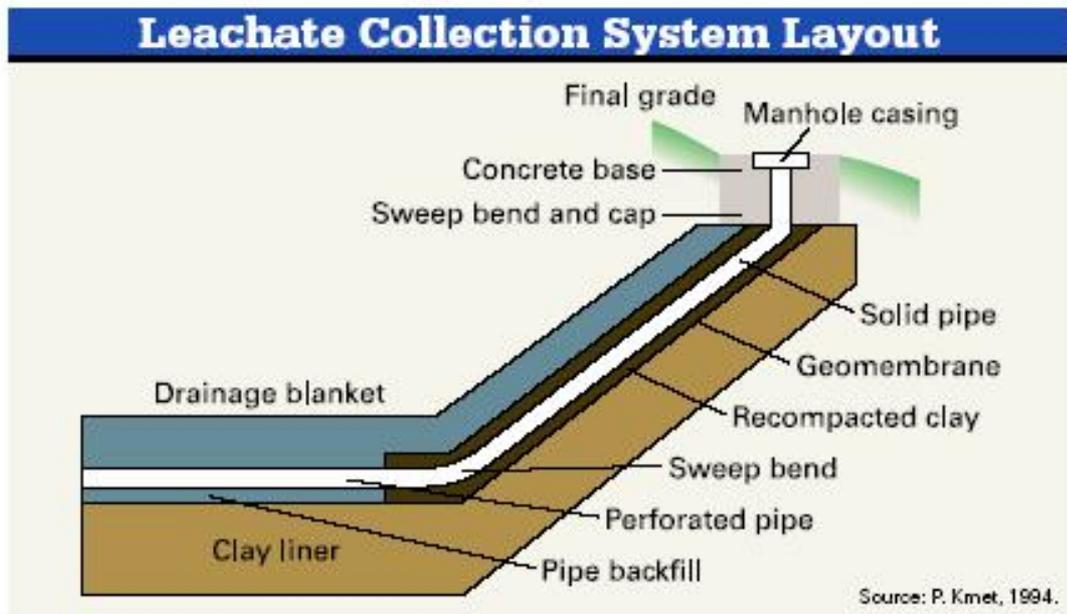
Typical layout of a leachate collection system (after Kinet, 1994).
